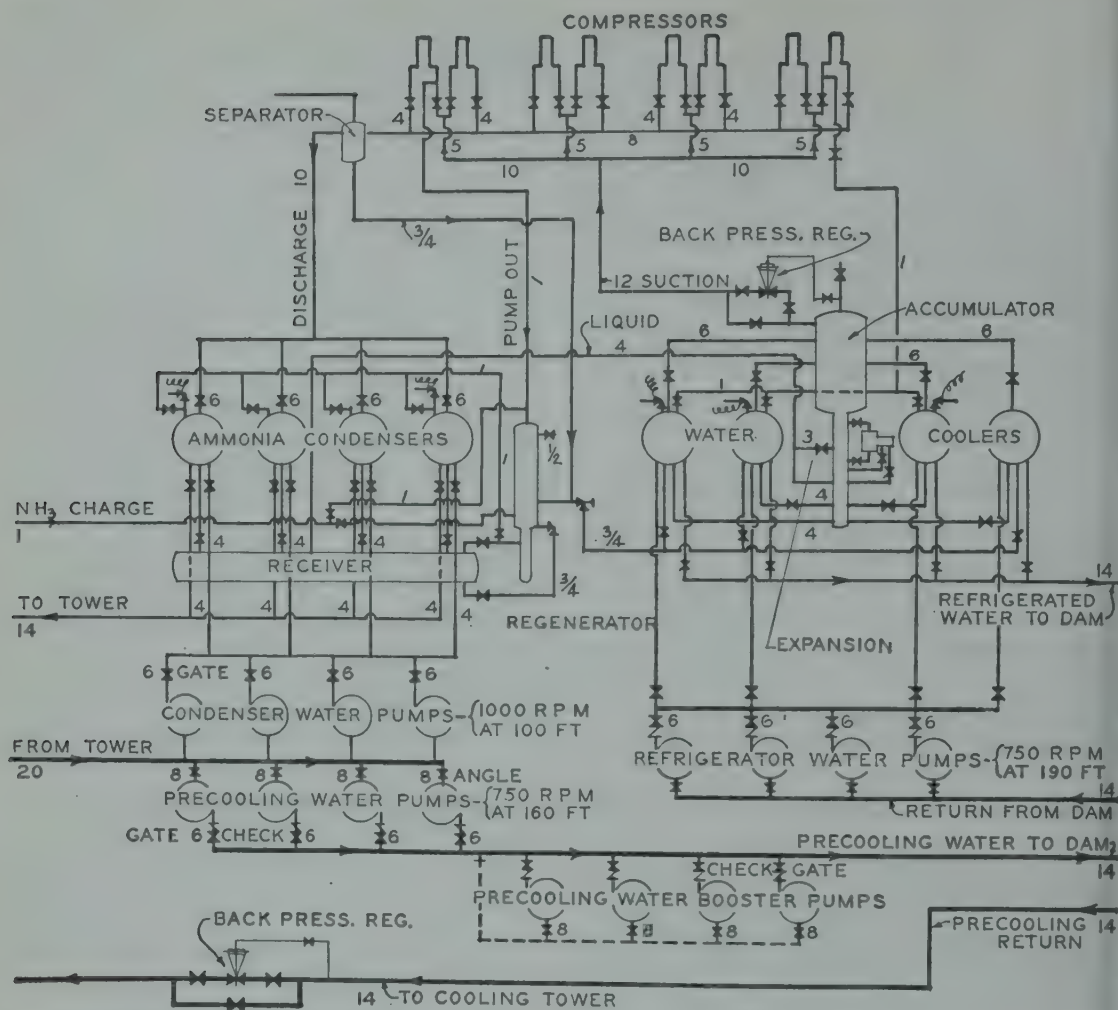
Layout of Refrigerating Apparatus for Cooling Coils Embedded in Concrete of Boulder Dam.
